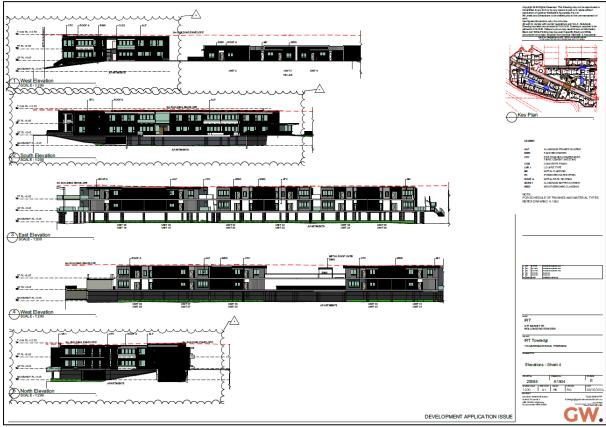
EXCERPT OF EAST, SOUTH, NORTH AND WEST ELEVATIONS (GARDNER WEATHERILL ASSOC.)
